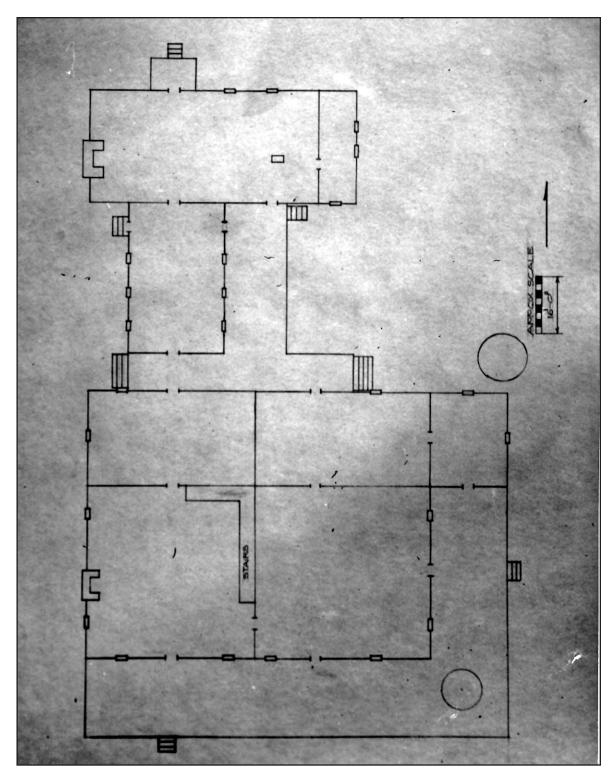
Floor plan of the James Taylor White II house, drawn by John V. Clay. Despite the fact that the scale is too big, the overall layout is extremely accurate. Unfortunately, the plan is not dated, nor is it known if Clay drew it from an on-site visit or from interviews with local informants. (Courtesy, JVCC).
